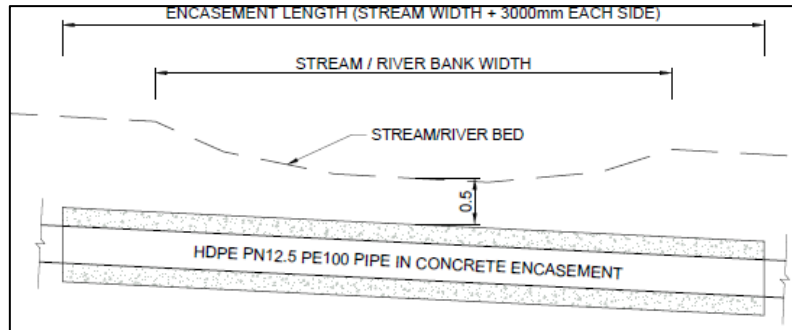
Longitudinal section of sewage pipelines crossing a watercourse (Lyners, 2025).
